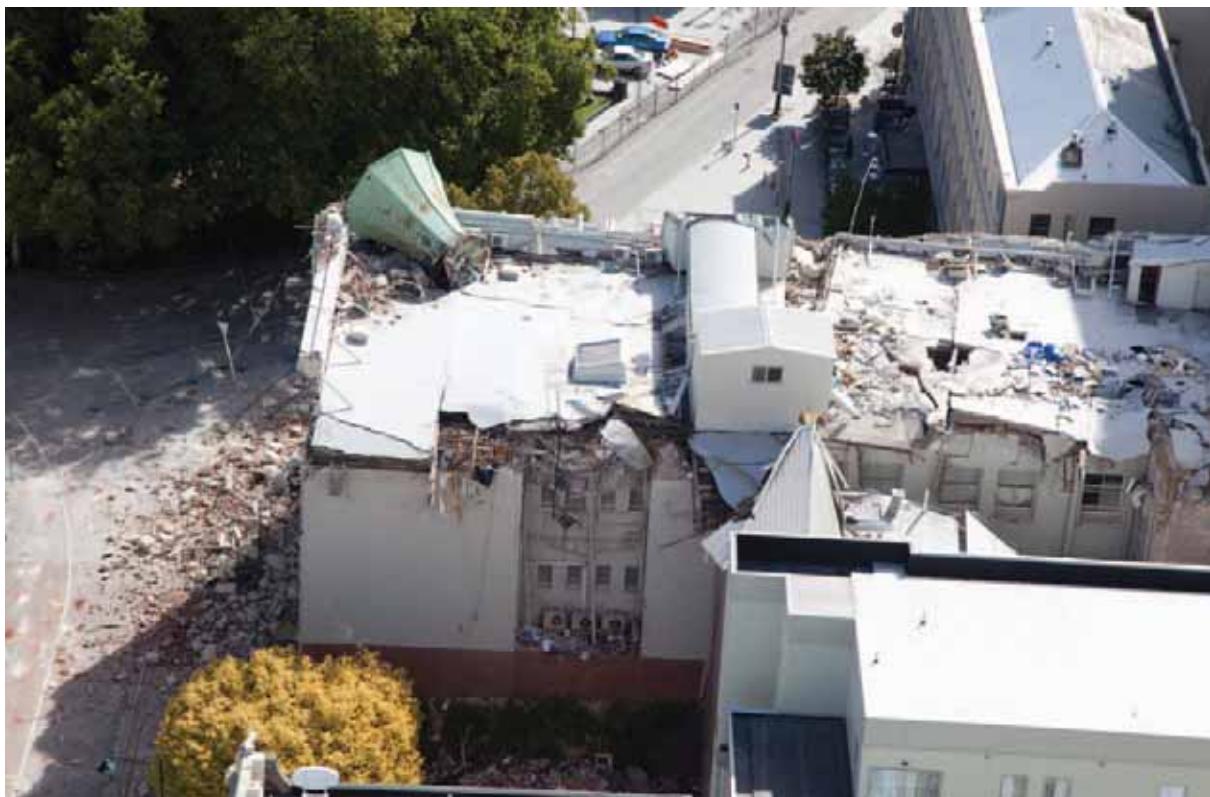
The roof and eastern wall of The Press building after the February earthquake
